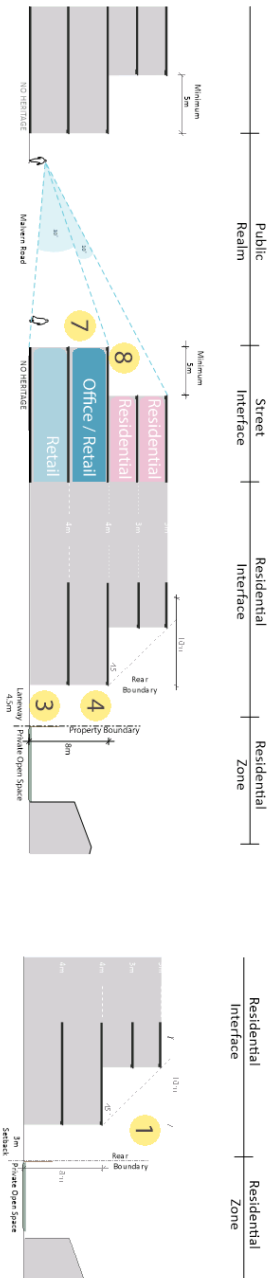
STREET SECTION AND LANEWAY INTERFACE
